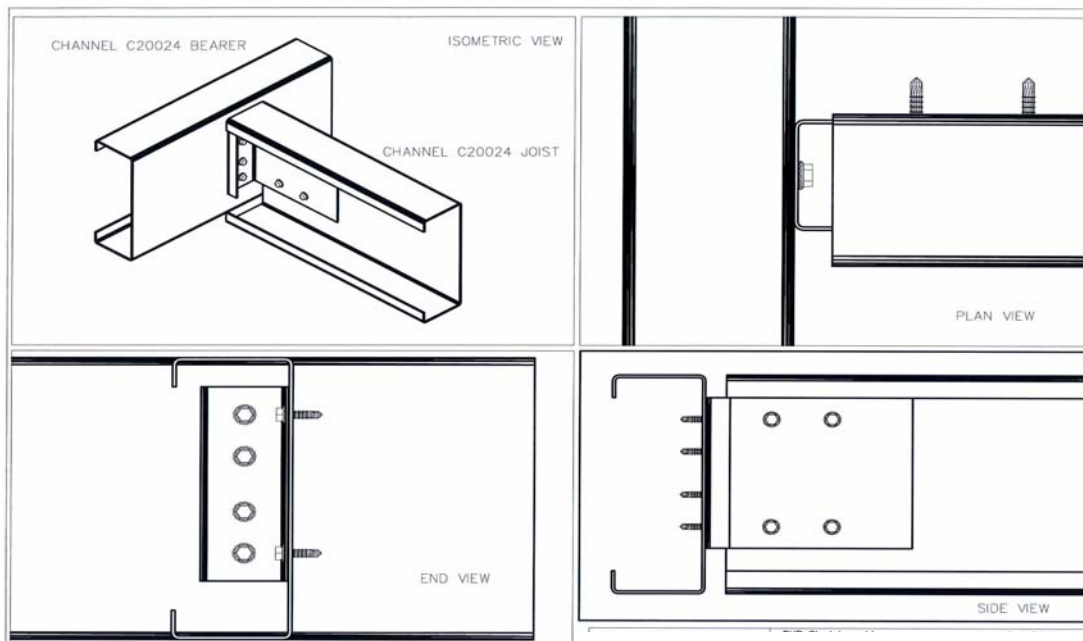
Joist to C-Section Bearer Connection for Flooring
